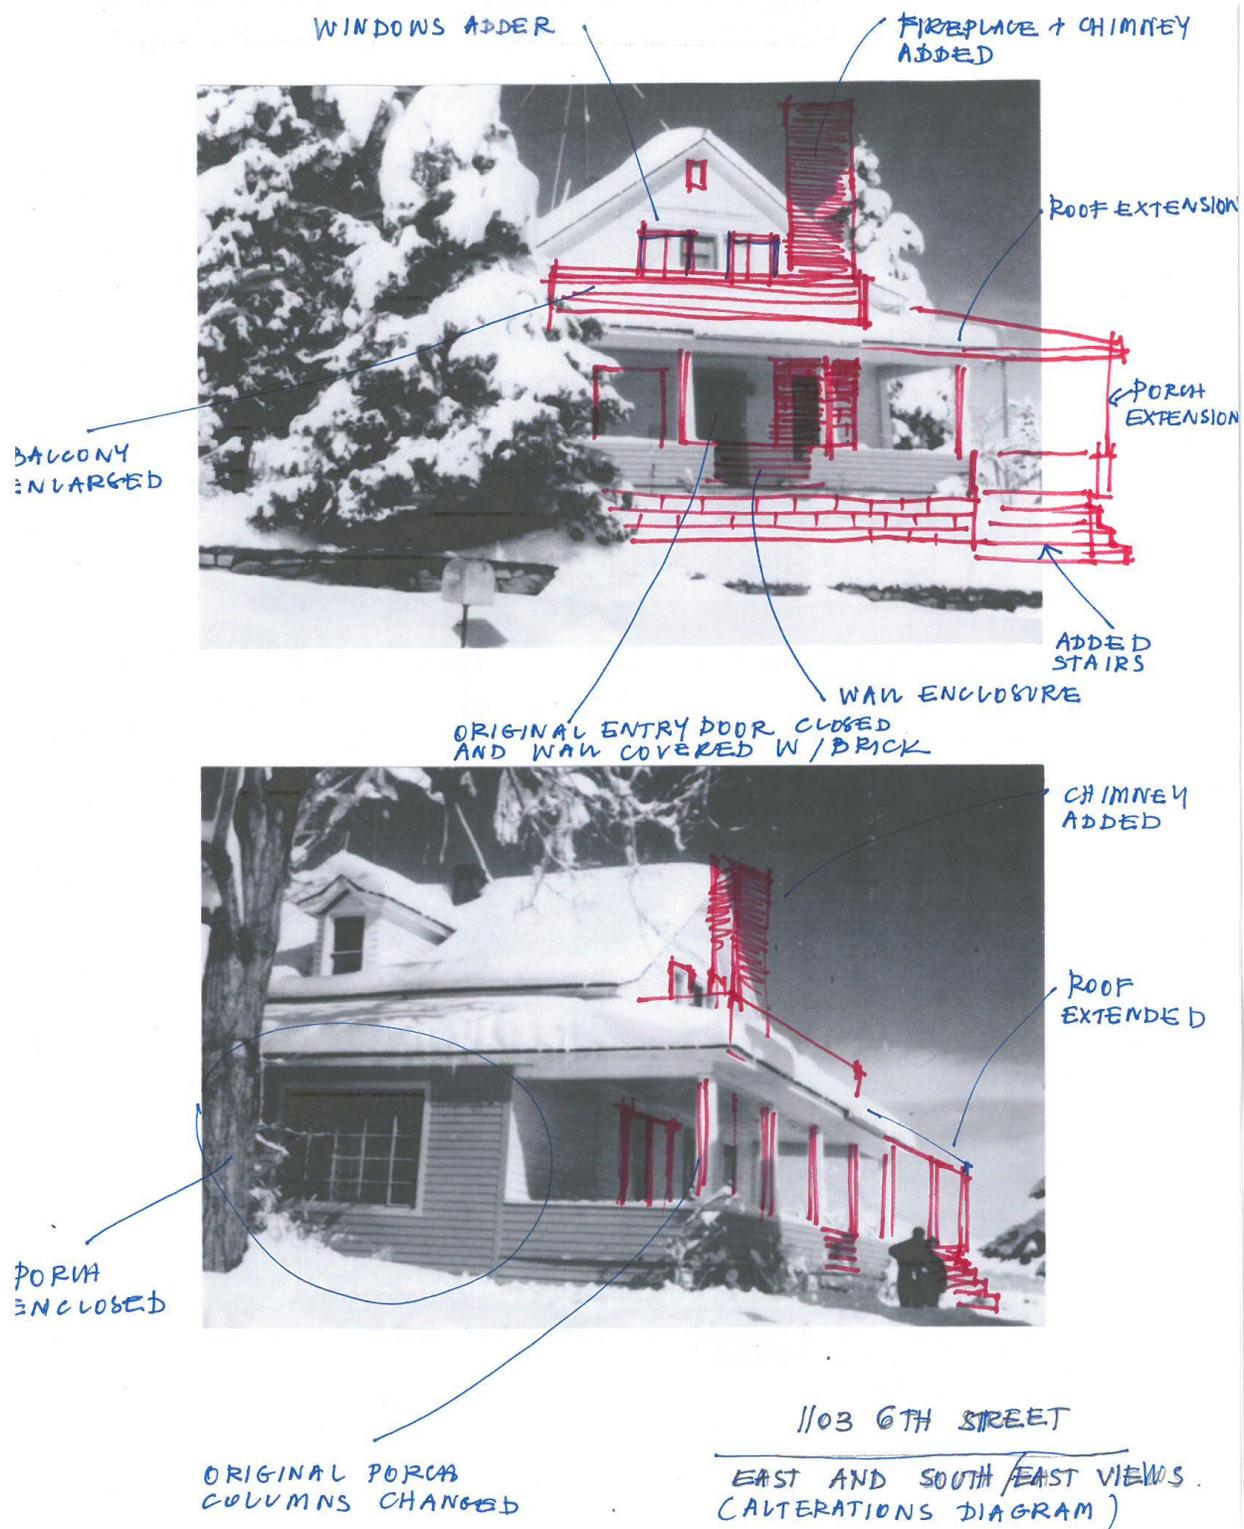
Applicant's diagram showing alterations to the south and east elevations
